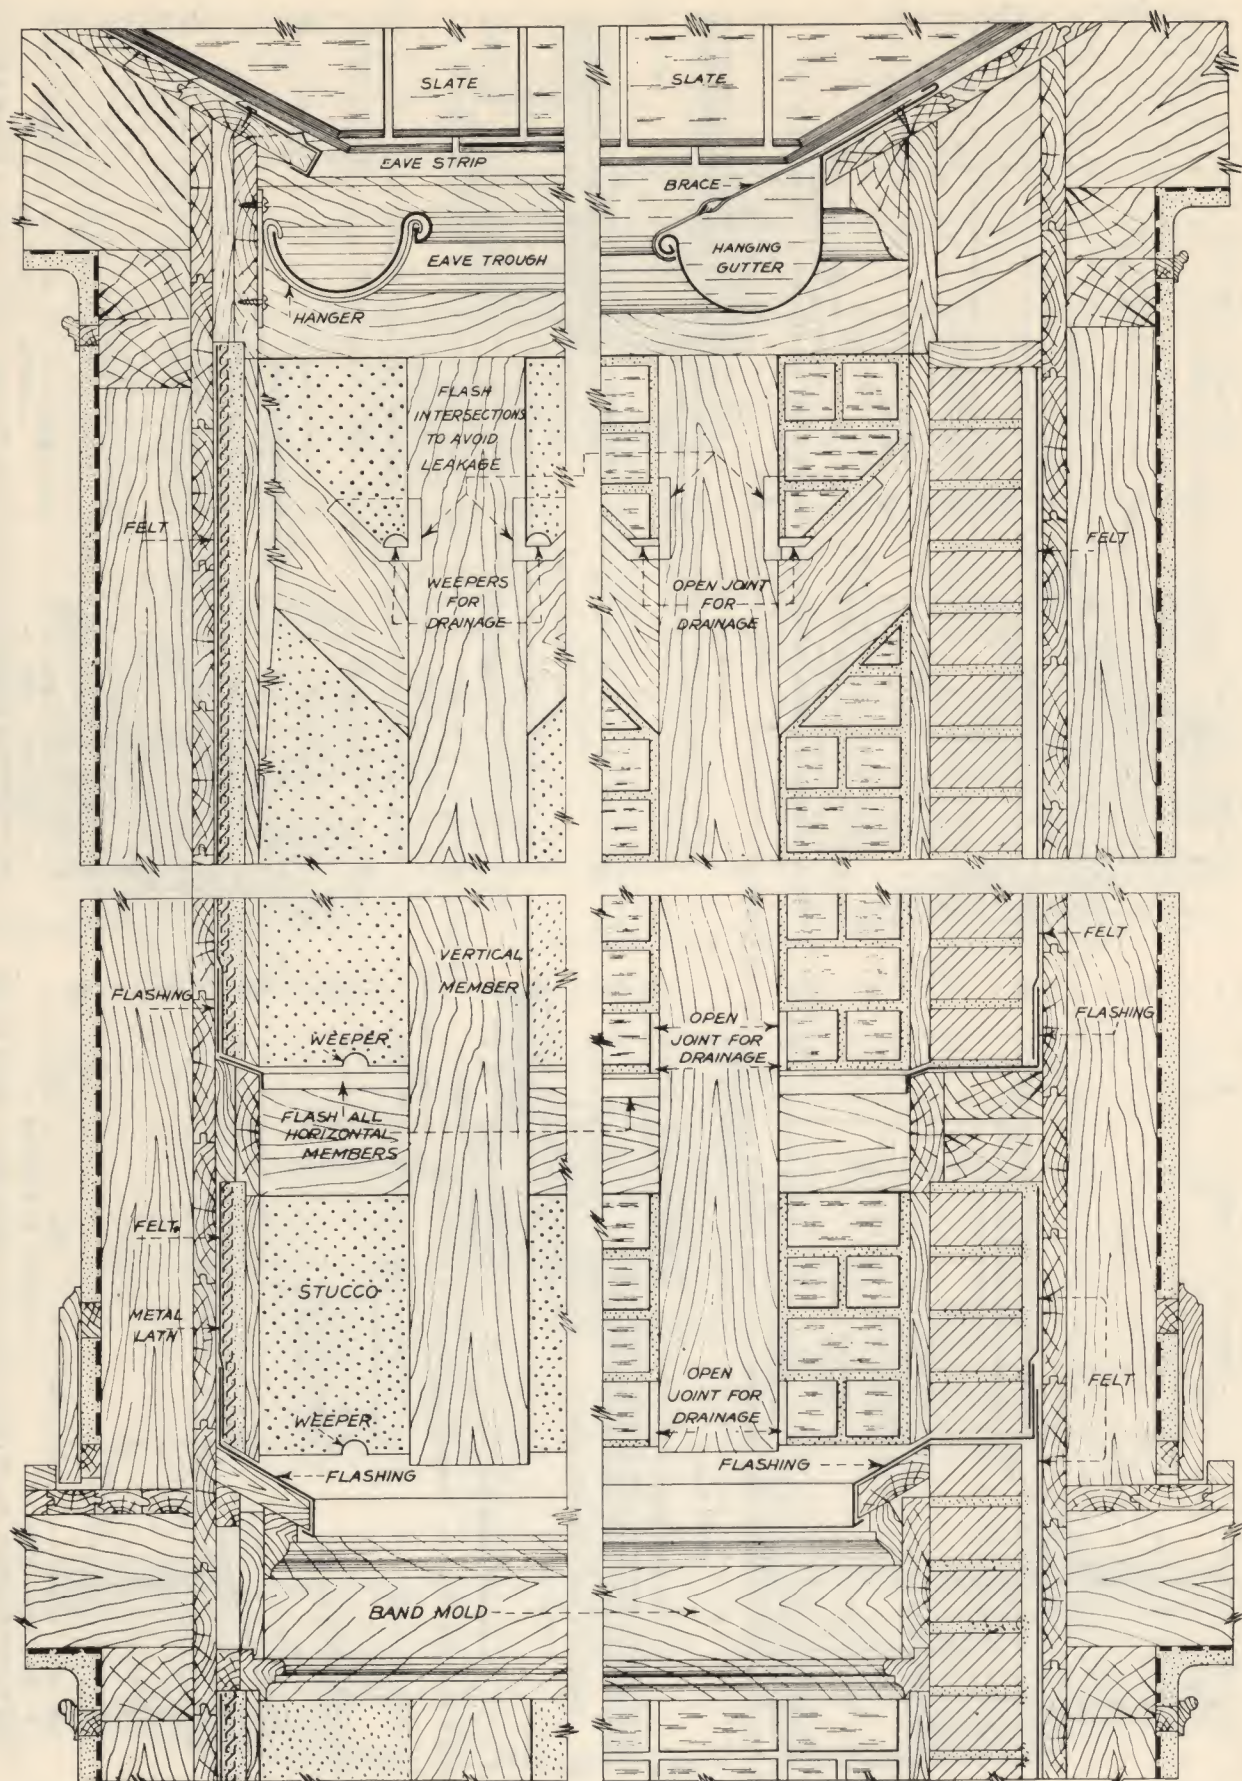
METHOD OF FLASHING ON STUCCO WALL — SCALE $1\frac{1}{2}'' = 1'-0''$ — FIG. 2 METHOD OF FLASHING ON BRICK VENEER WALL
